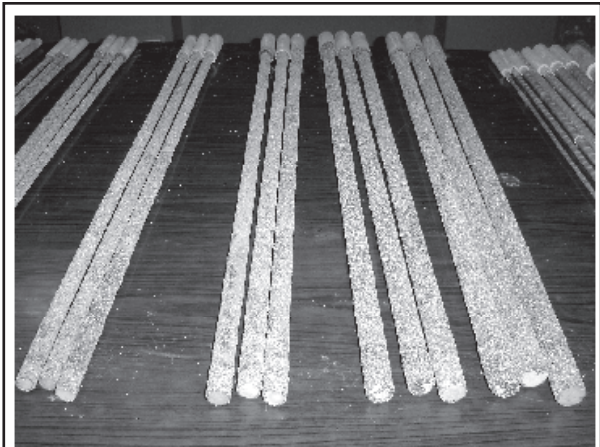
GFRP REBARS FOR PULL OUT TESTS
